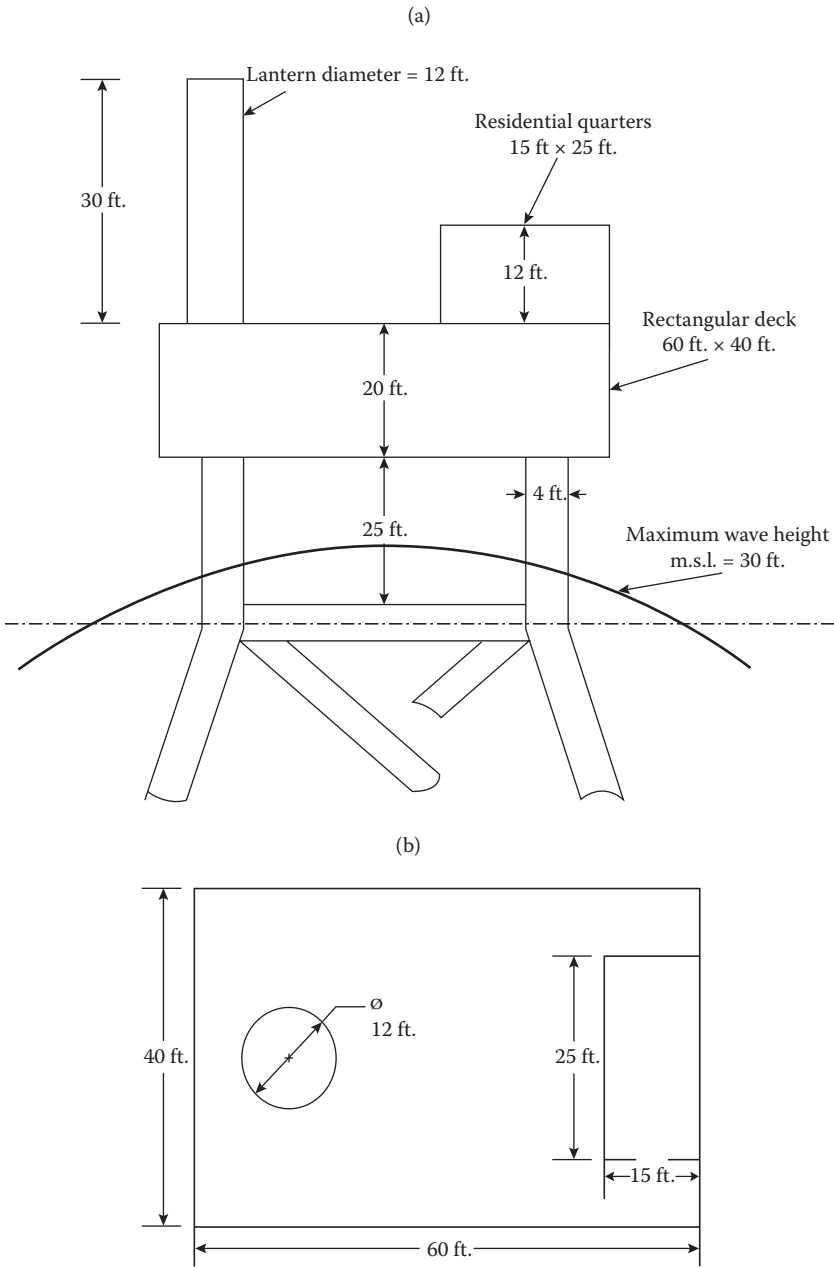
(a) Elevation and (b) plan of lighthouse tower.
